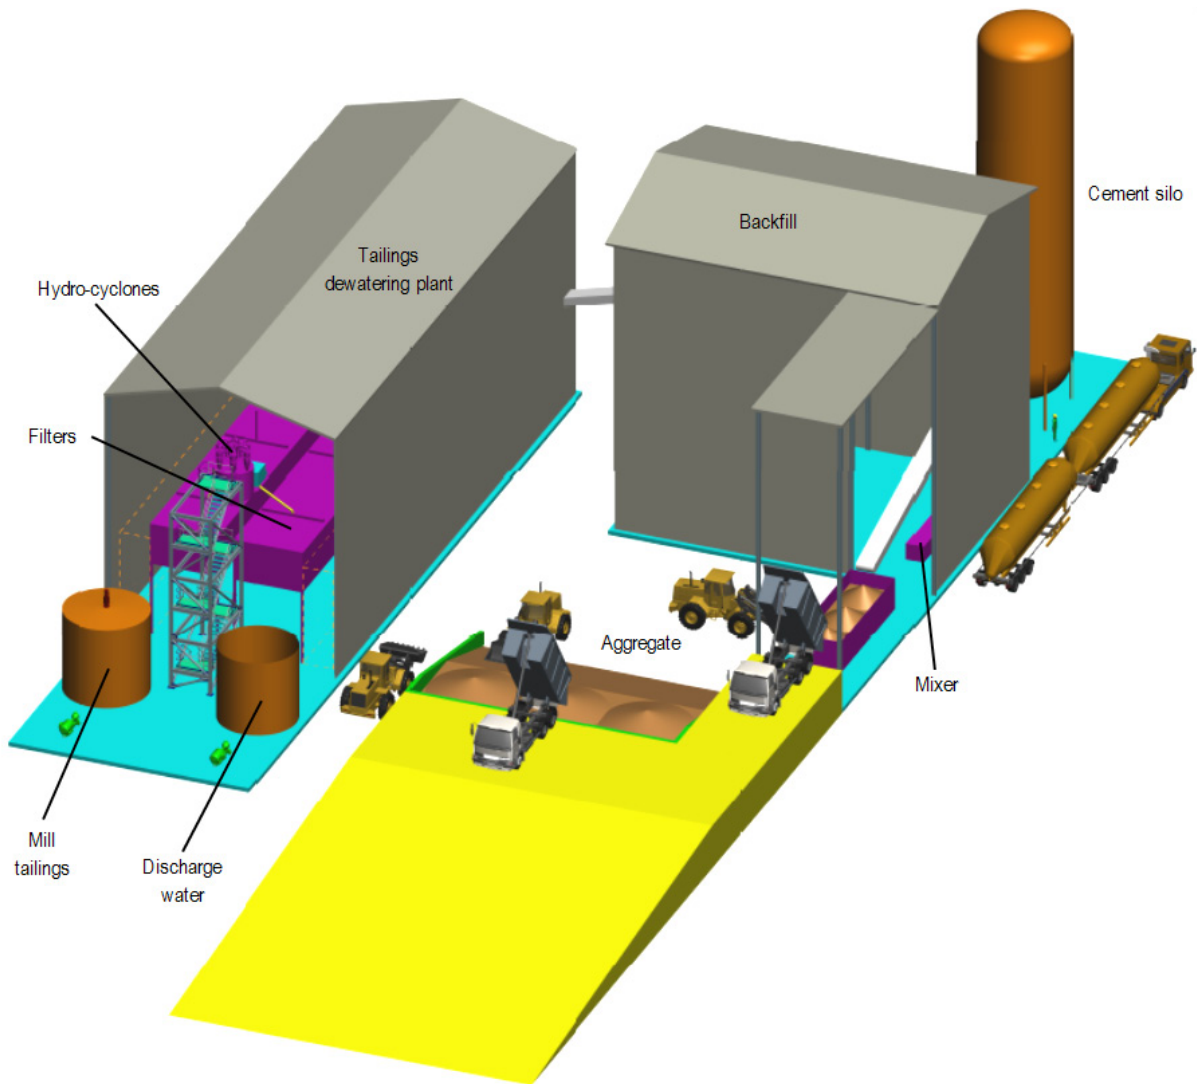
Indicative image of the backfill plant and tailings dewatering plant
